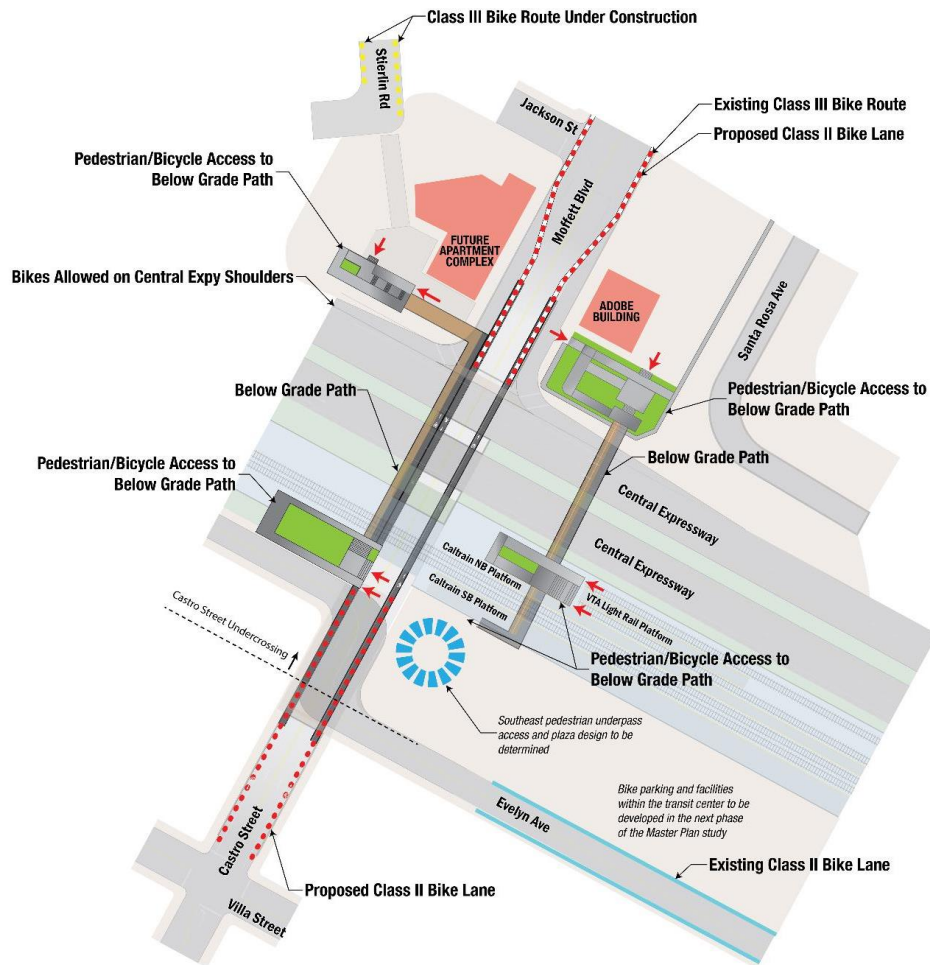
Alternative 1: Pedestrian and Bicycle Plan
